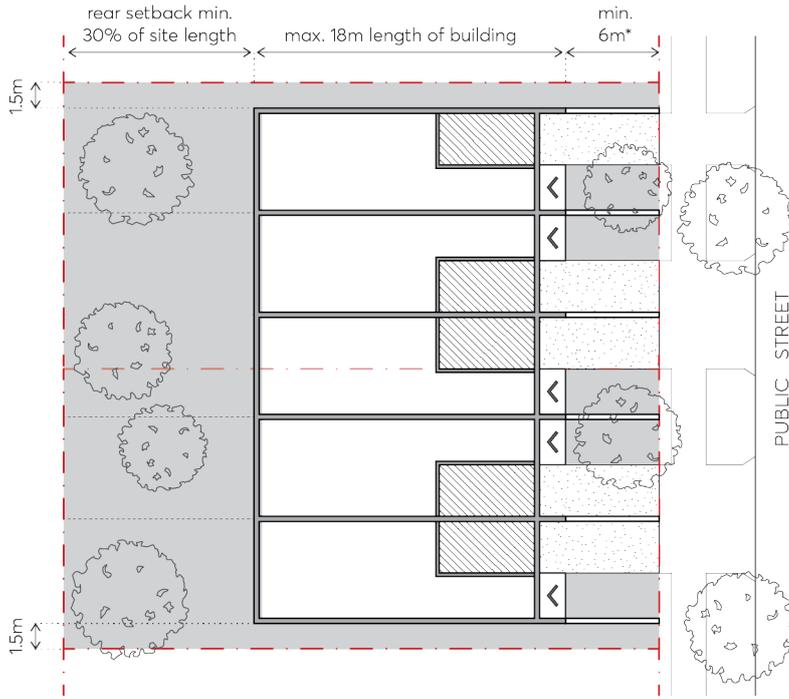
Terrace Housing Site Setbacks
